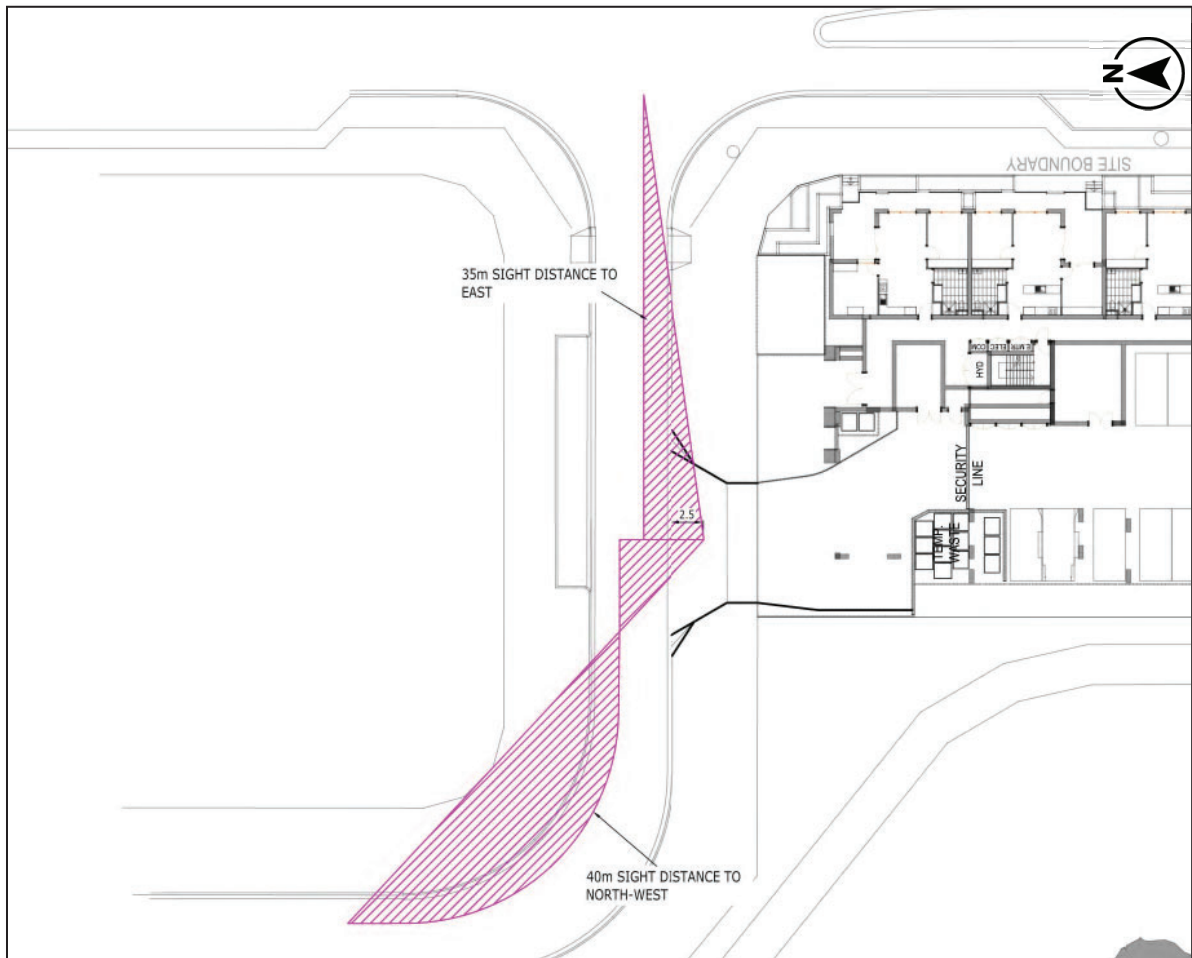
PROPOSED GROUND FLOOR LAYOUT
